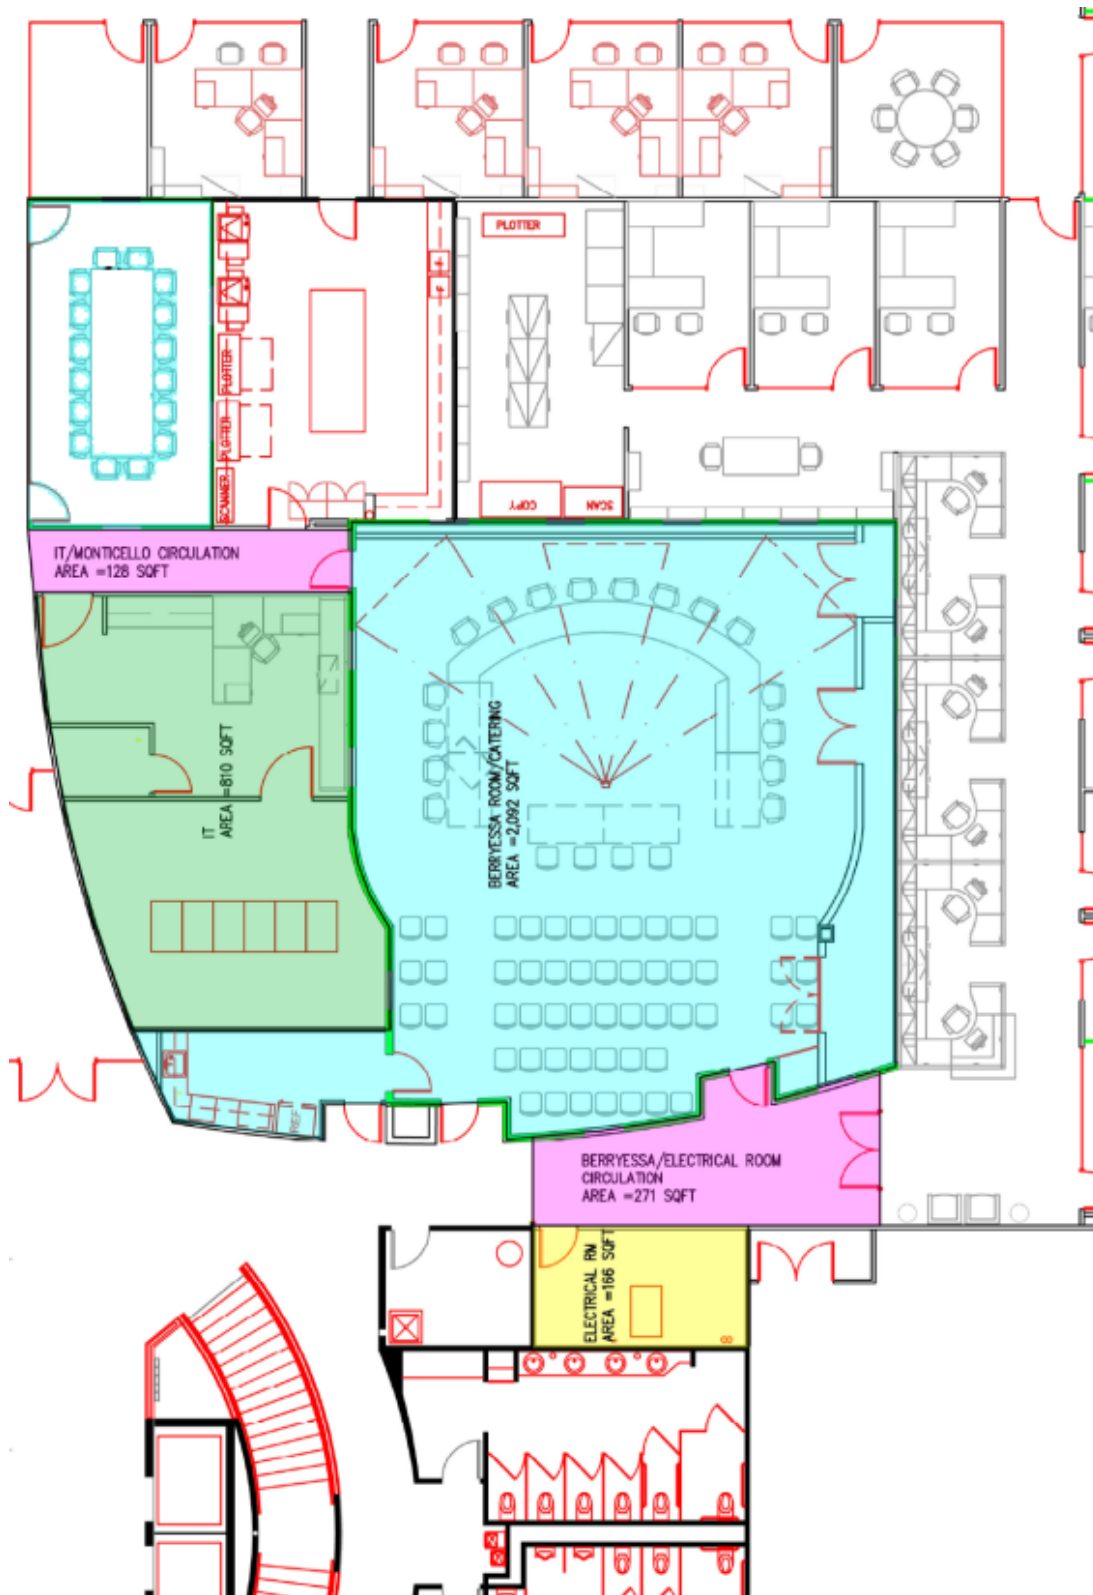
EXHIBIT B PROPOSED CORRIDOR AND CONSTRUCTION PLANS
